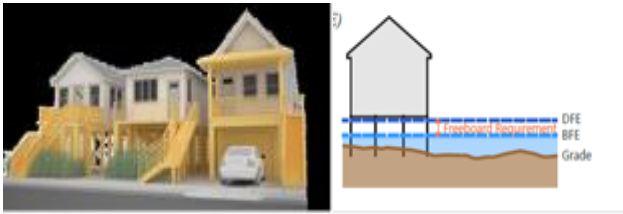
Building elevations for flood prone areas (Source: www.nyc.gov/retrofitting)
